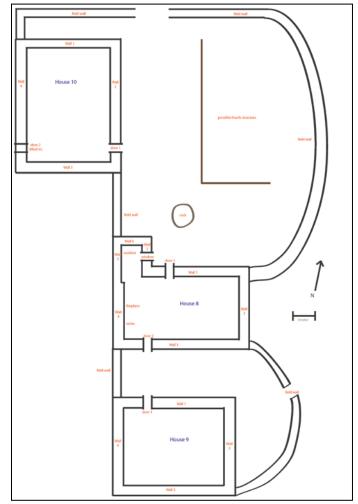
Houses 8, 9, and 10 Floor Plan, Carmacullew
